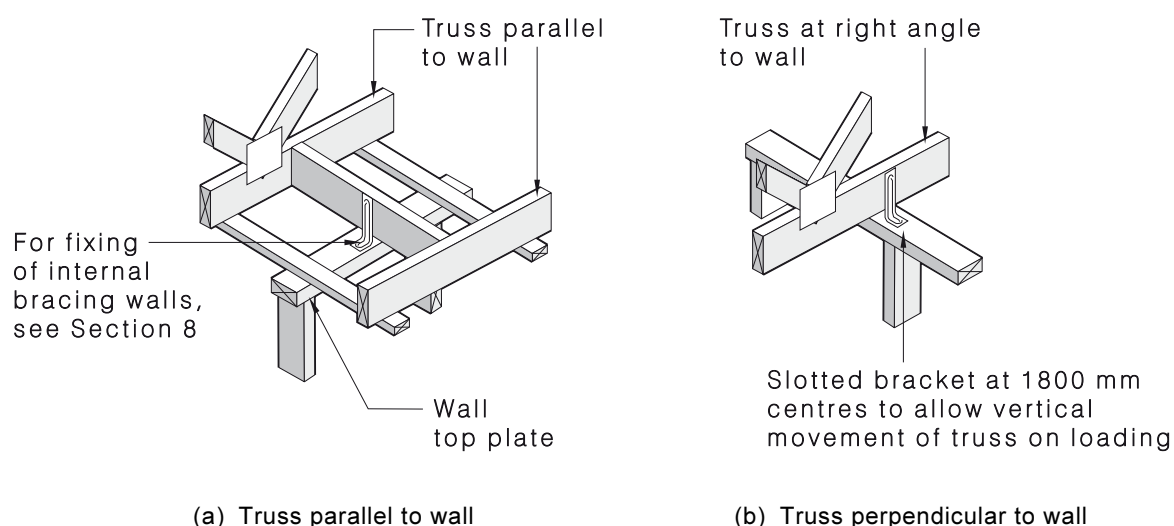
FIXING OF TRUSSES TO A NON-LOADBEARING INTERNAL WALL
